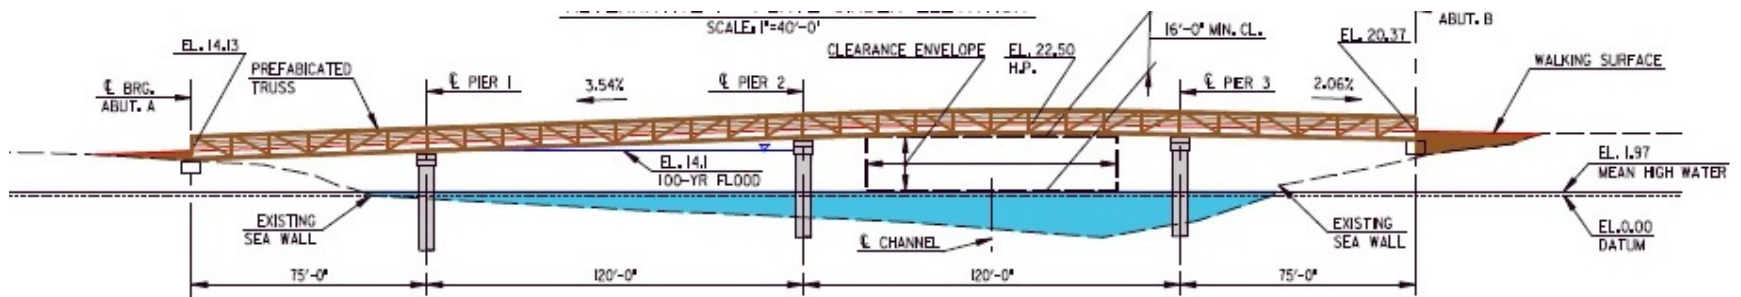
PREFABRICATED STEEL TRUSS BRIDGE DESIGN EXAMPLE
